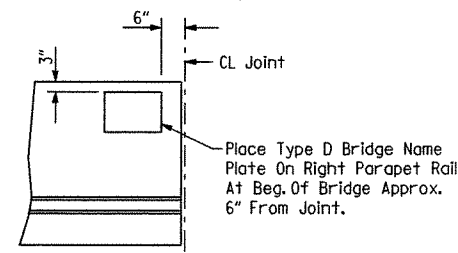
DETAILS OF OPTIONAL SLIPFORMING OF CONCRETE PARAPET RAIL
